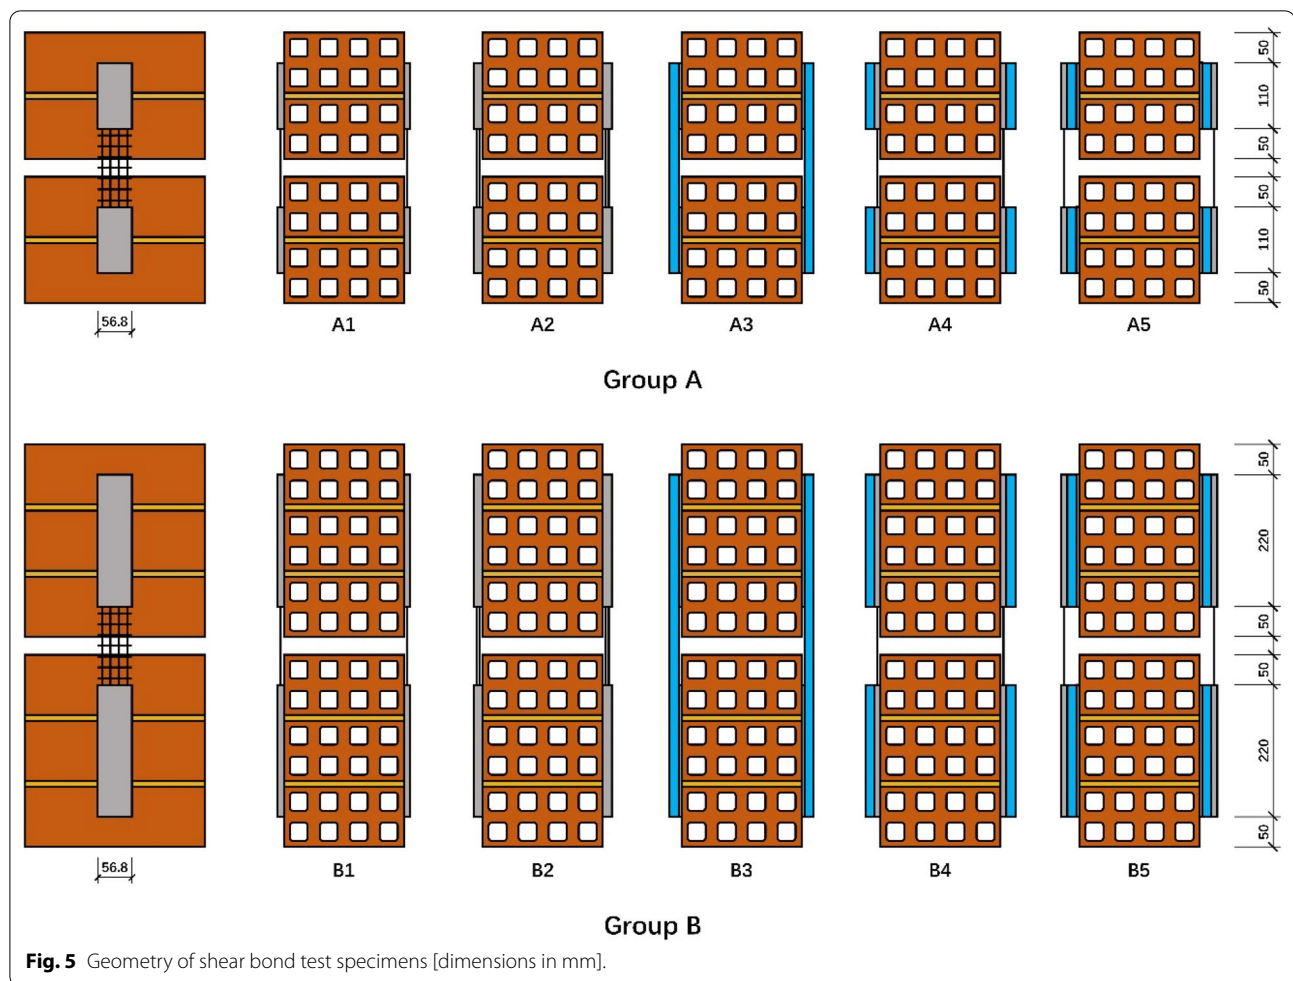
Geometry of shear bond test specimens [dimensions in mm].
